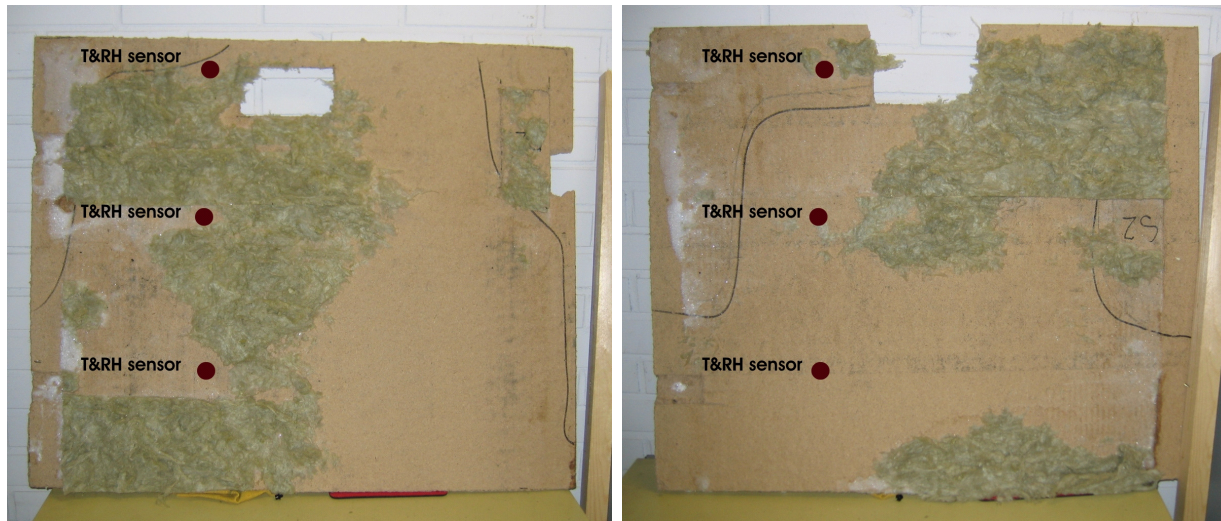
Condensation and frost with mineral wool pieces on the inner surface of the sheathing of the attic floor and on the timber-frame wall (left) and the AAC wall (right).
